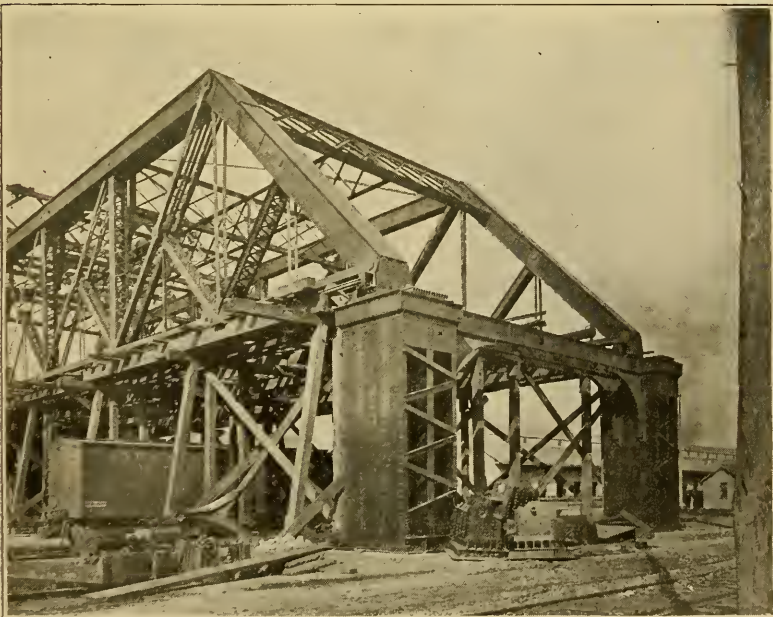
TYPICAL TRUSS AND COLUMNS.
